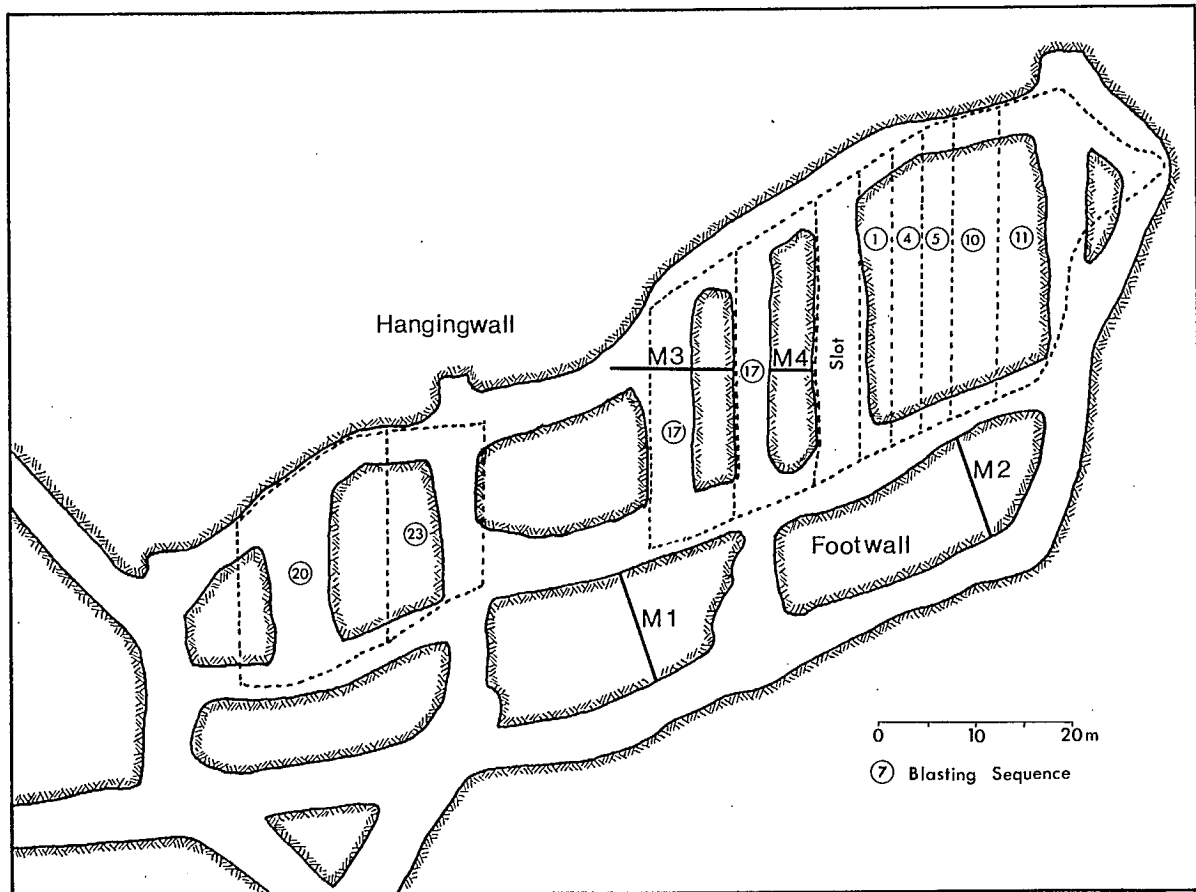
Plan of 8.2 sub-level showing layout of borehole extensometers
